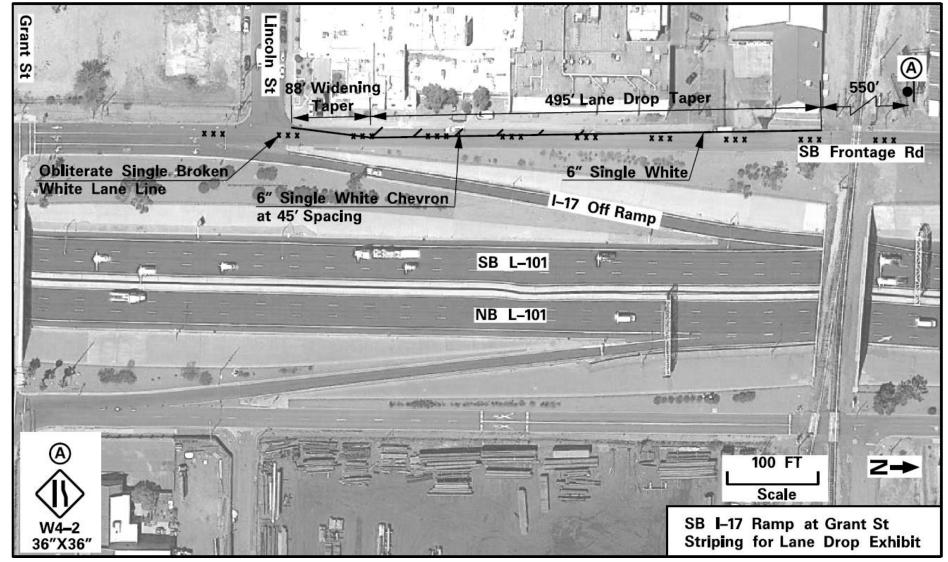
Recommended Pavement Marking Schematic at I-17 and Grant Street SB Ramp
